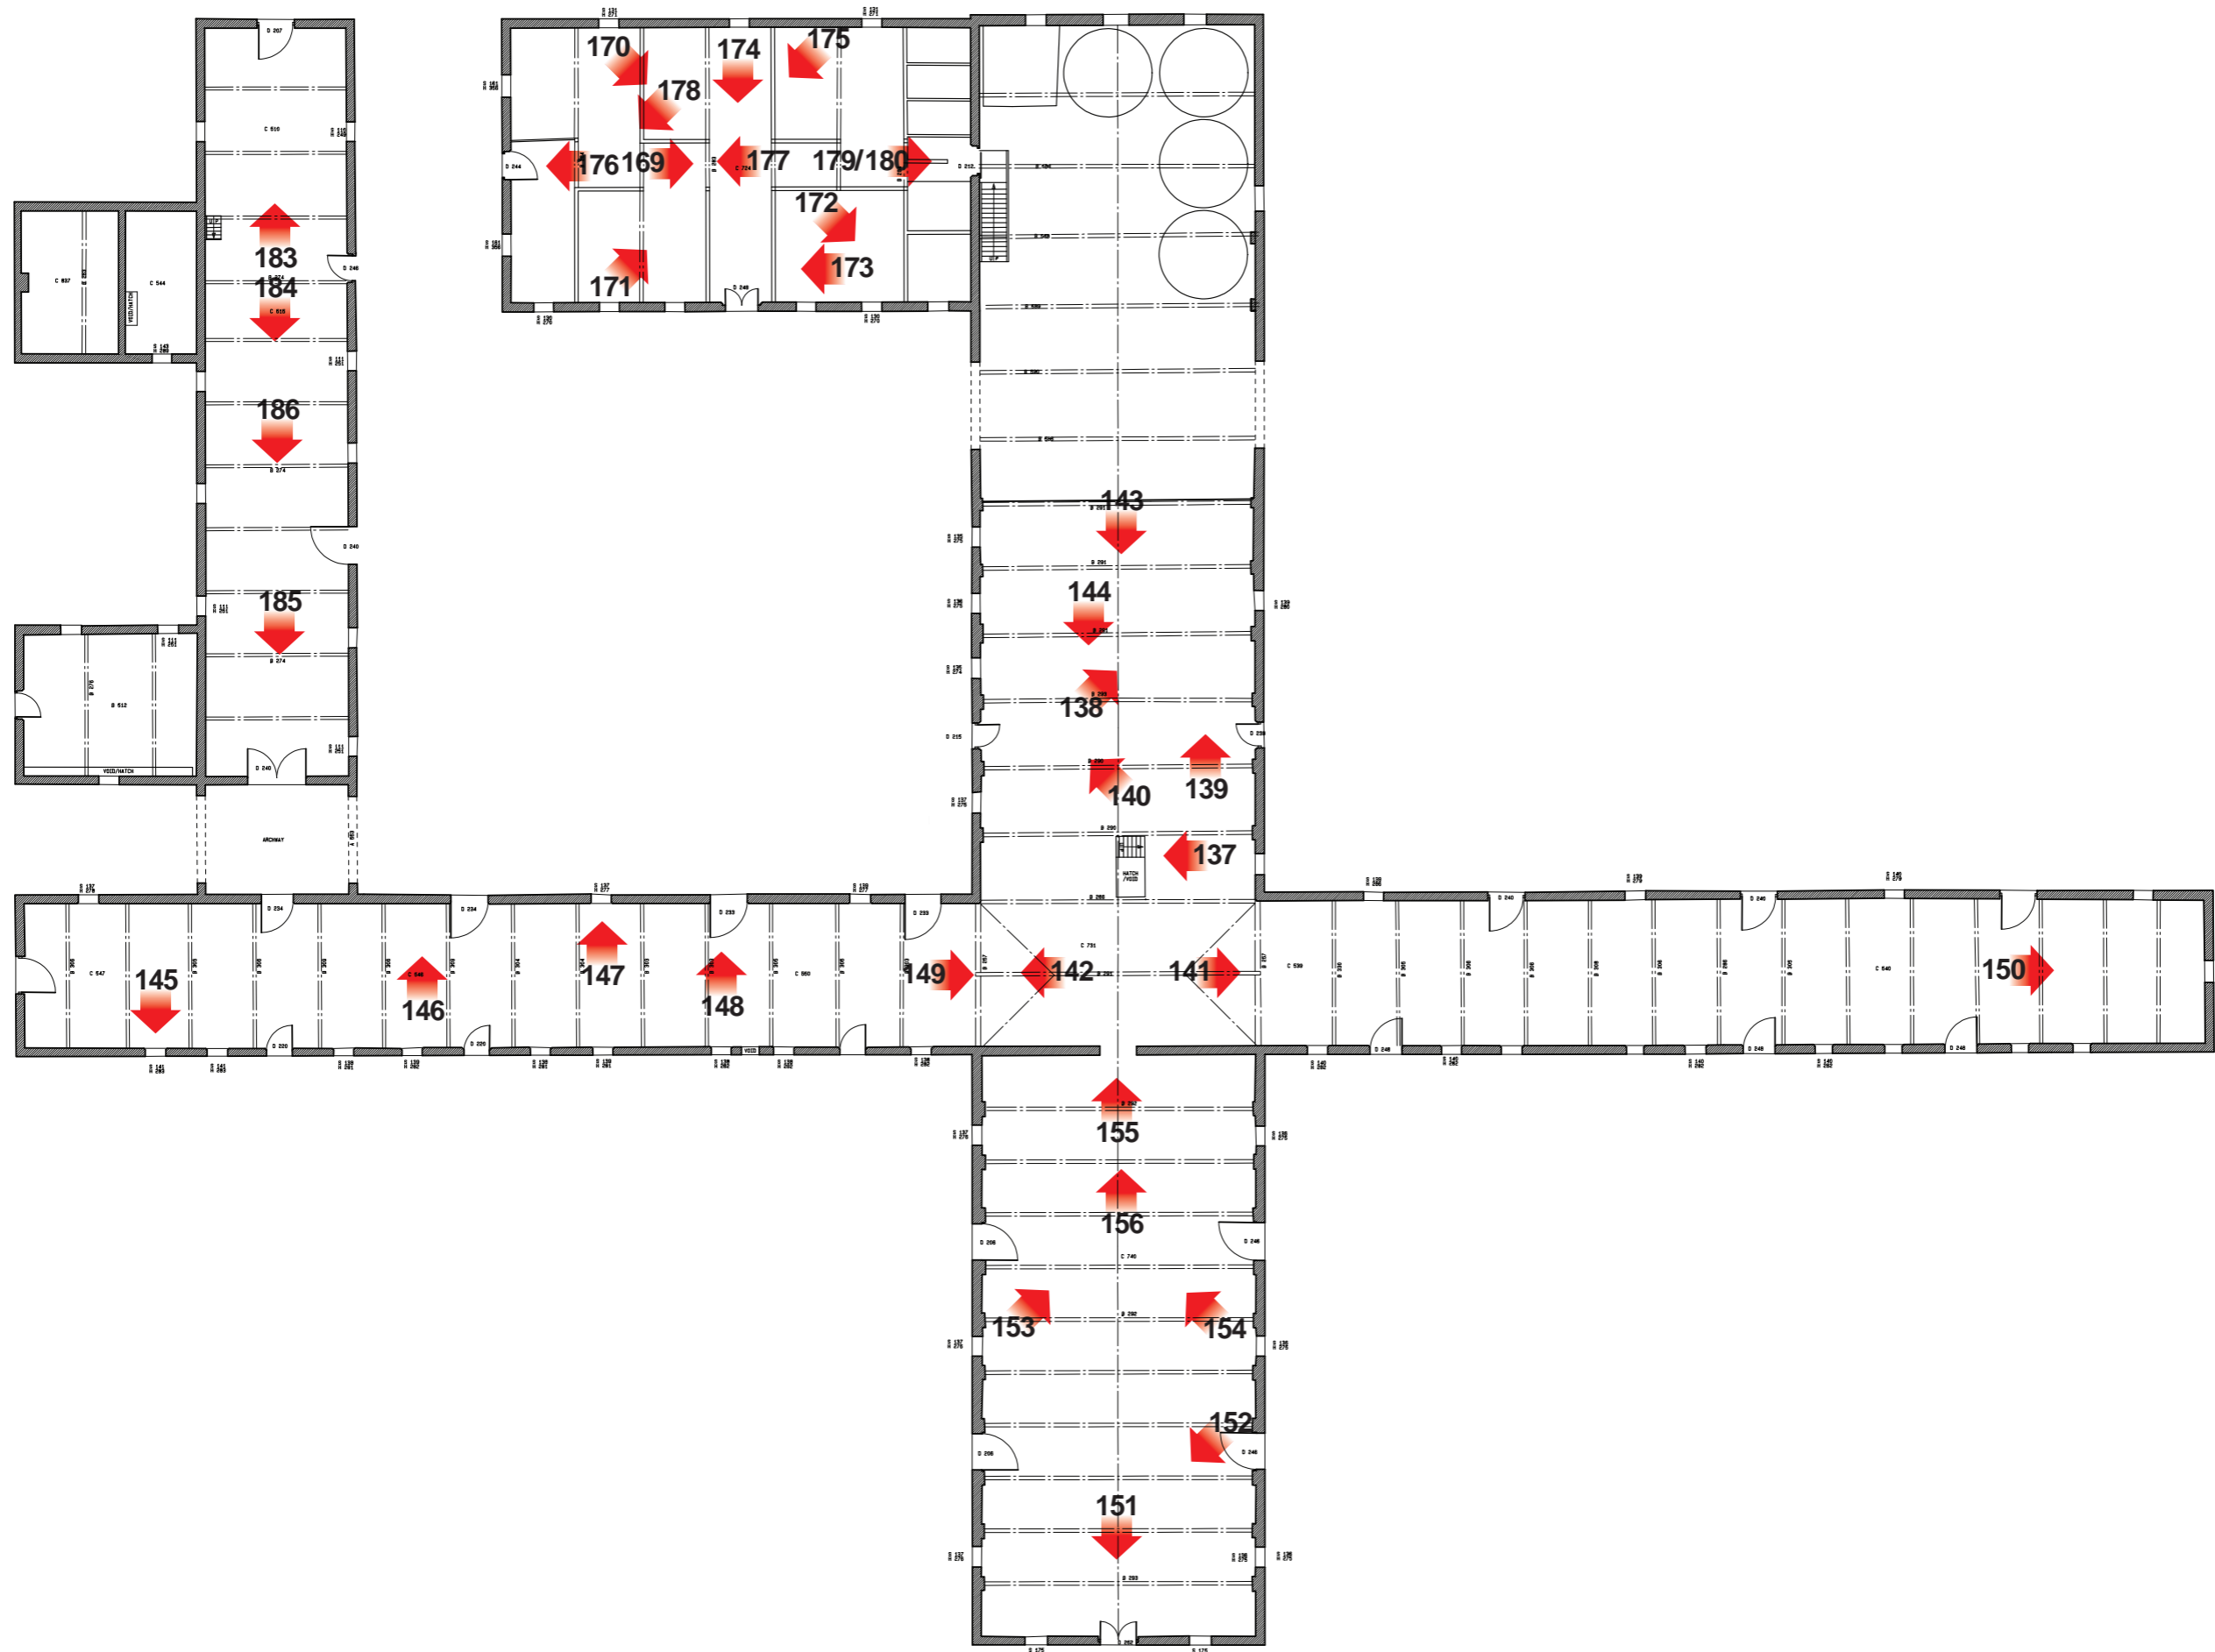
Plan showing directions of photographic plates relating to inside (first floor) of farm structure
